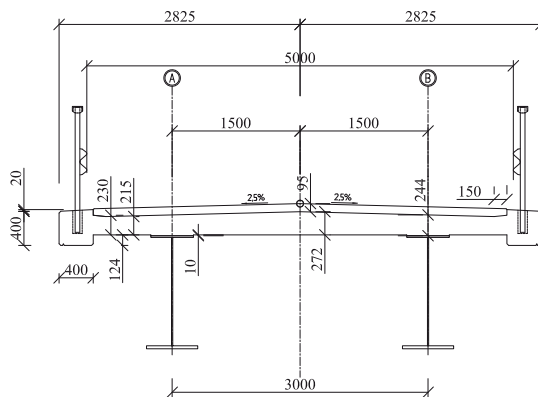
Deck cross section of the bridge over the Leduån (dimensions in mm)
